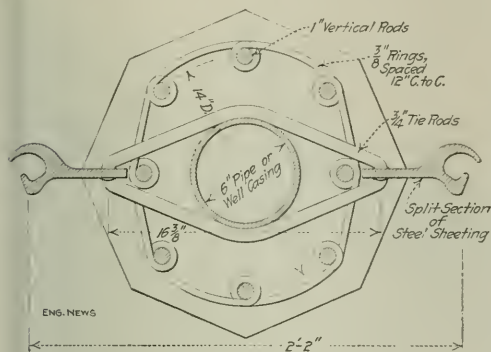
SECTION OF REINFORCED-CONCRETE ANCHOR PILE USED IN A LINE OF STEEL SHEETING
